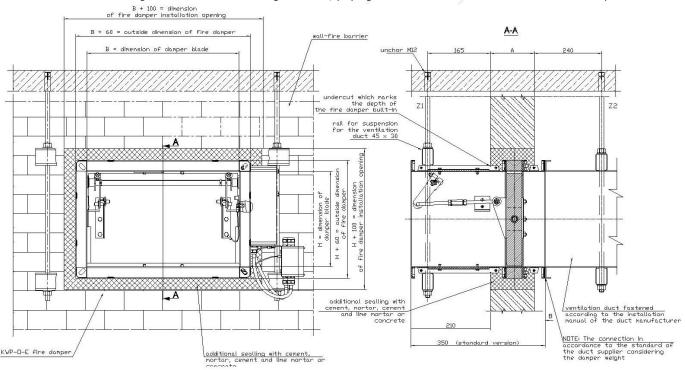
Installation method of fire dampers KWP-O in rigid wall
